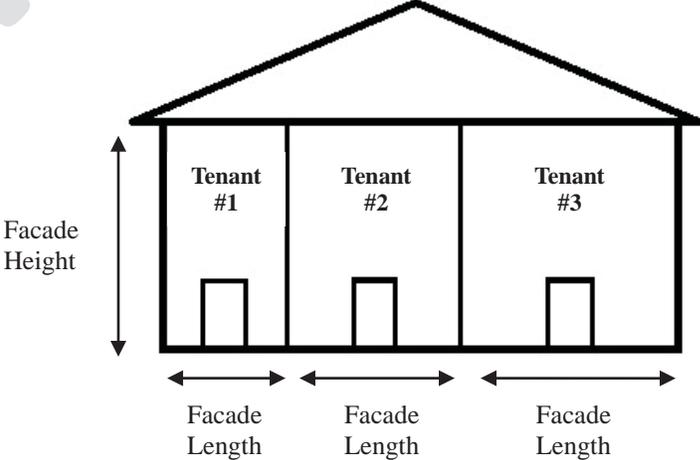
Multi-Tenant Façade Calculation Example #2
